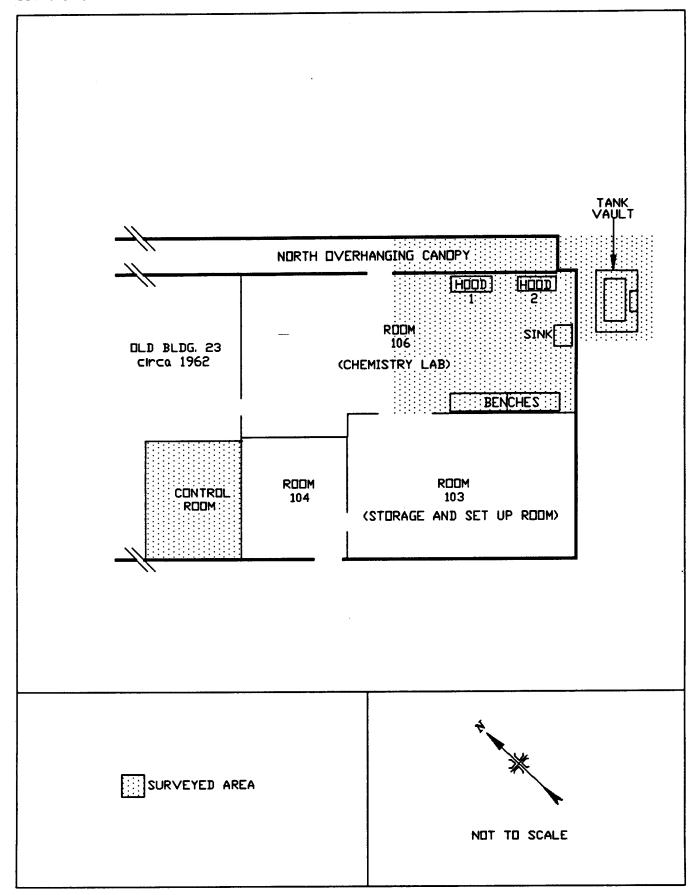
Building 023 - Floor Plan and Surveyed Areas
